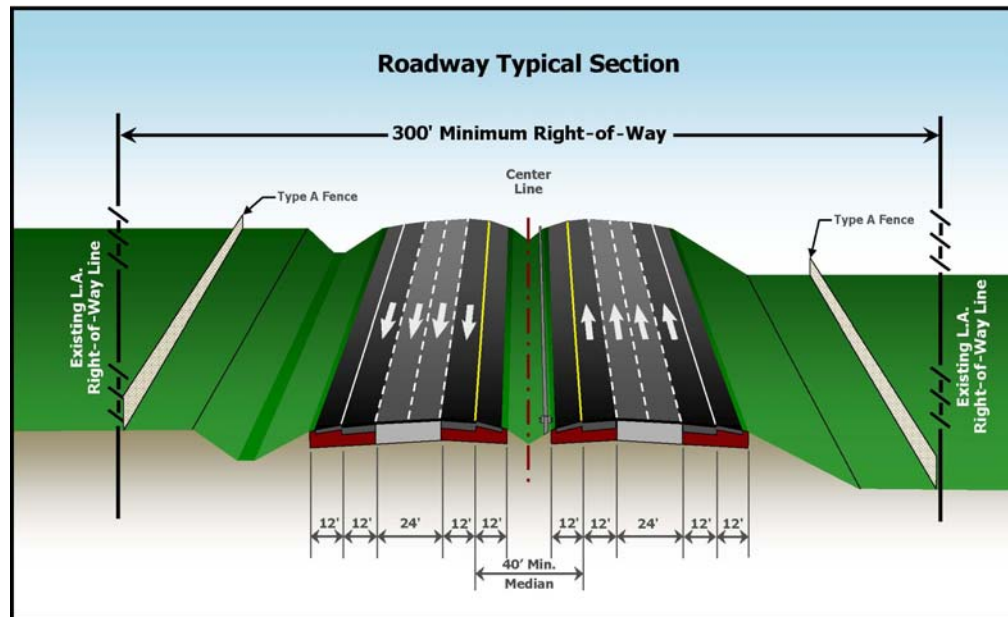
Recommended "Ultimate" Inside/Outside Widening of Interstate 75
